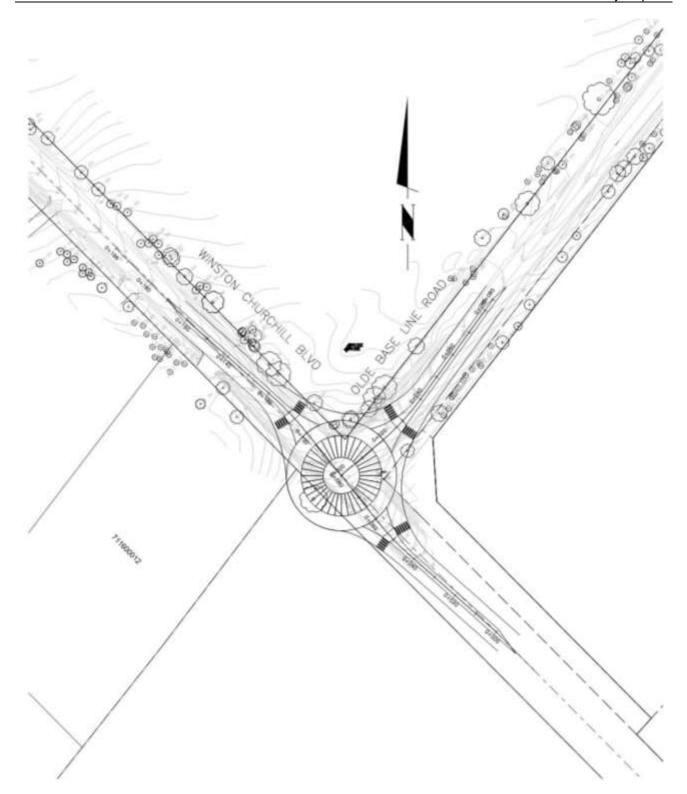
Winston Churchill Boulevard / Olde Base Line Road Roundabout Concept
